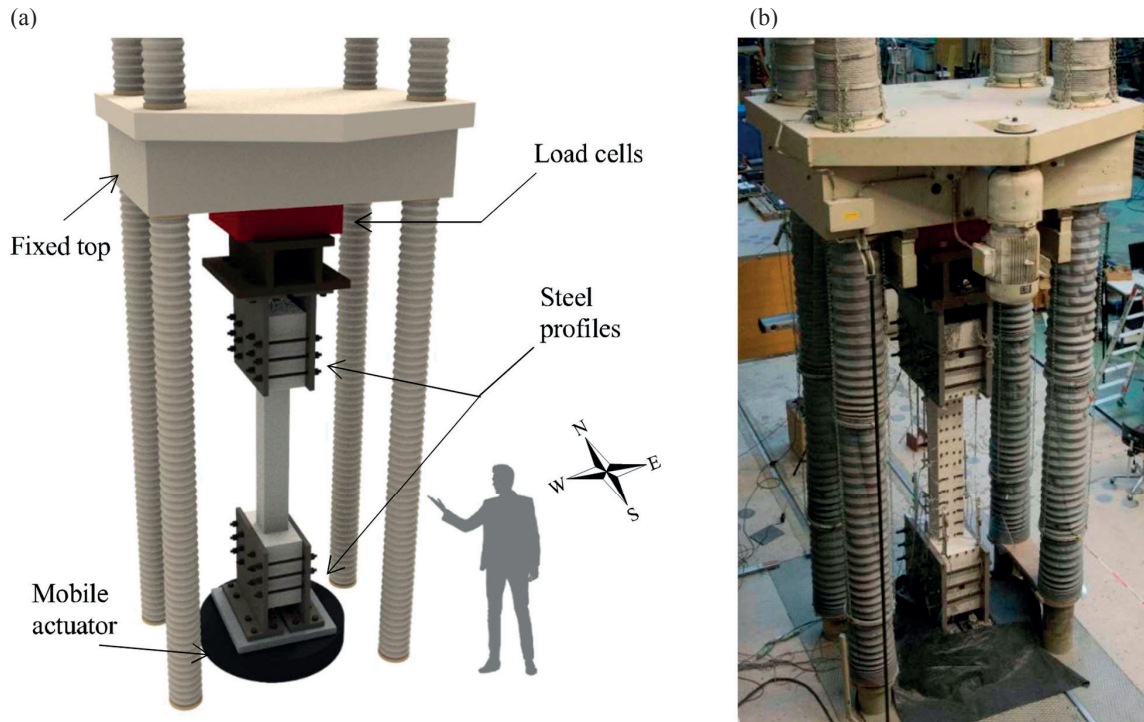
Test setup: (a) CAD rendering; (b) Bird's-eye view.
